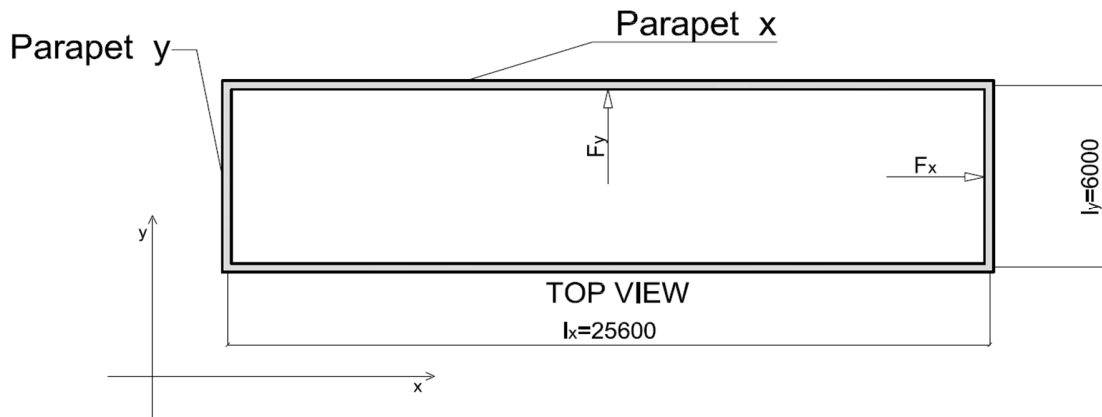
Building Top View with Parapet Reference Index used in the Design
